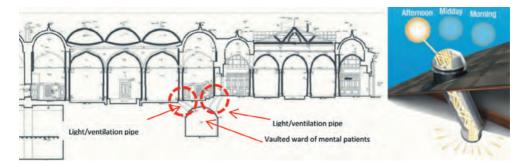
Süleymaniye Hospital light/ventilation pipe detail on the vault of the mental patients' ward (left) (source: drawing archives of Directorate General of Foundations, 2016) and contemporary light pipe detail (right) [10].
